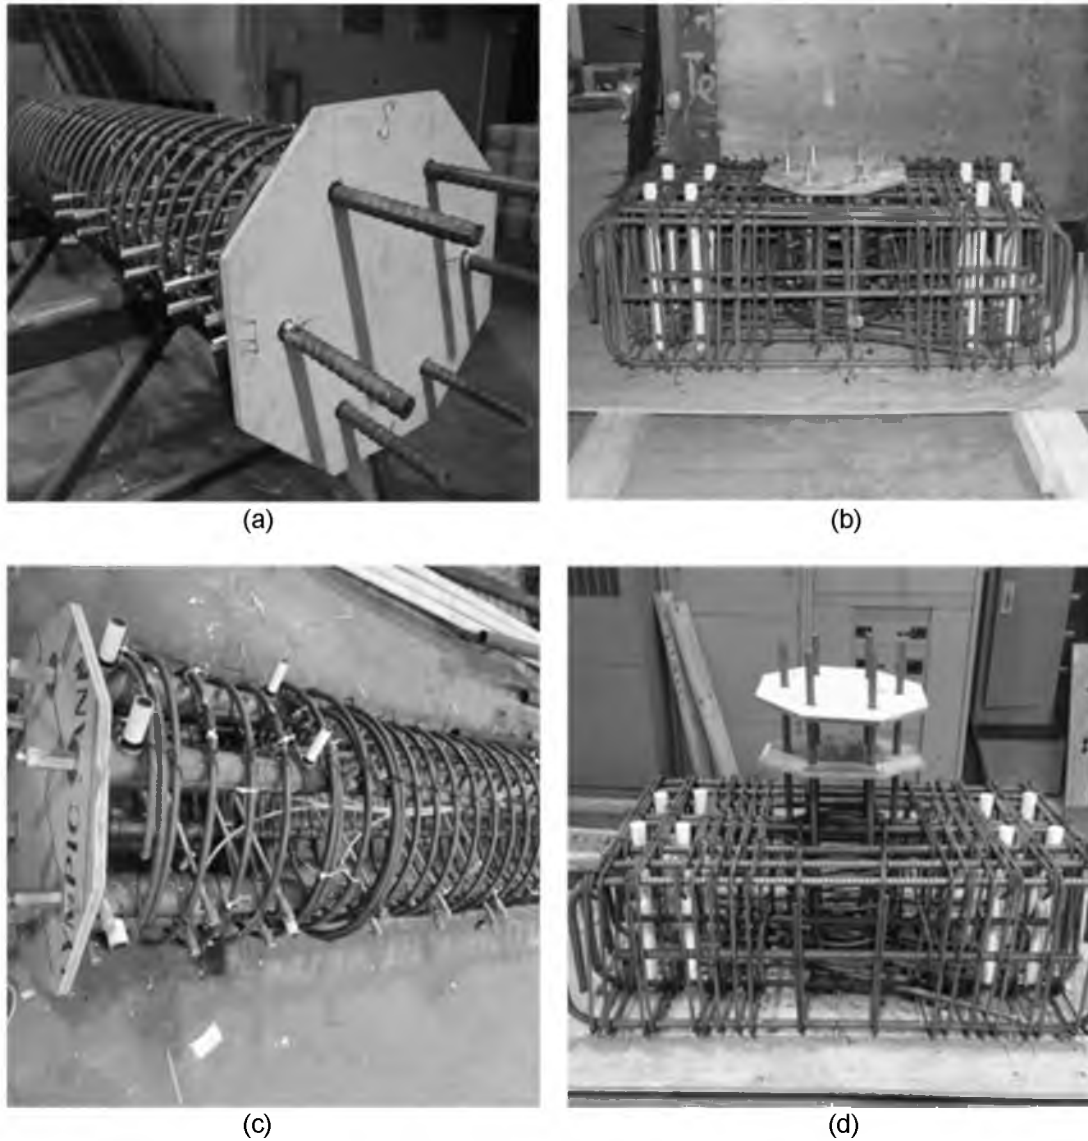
Rebar cages: (a) NMB-2 column, (b) NMB-2 footing, (c) NMB-3 column, (d) NMB-3 footing
